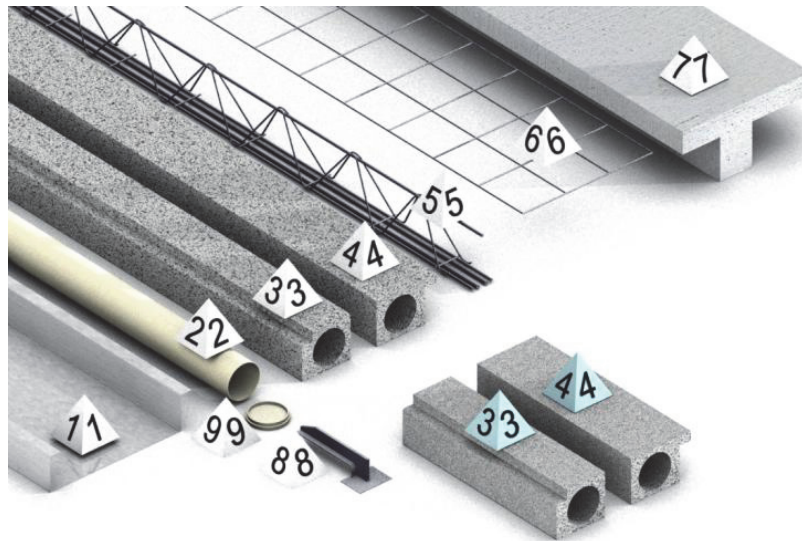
Range of elements: 1) Profiled steel sheeting, 2) cardboard tube, 3, 4) lightweight concrete fill, 5) reinforcement, 6) steel mesh, 7) bearing concrete fill, 8, 9) additional accessories
